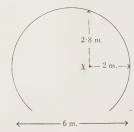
Disposition of apparatus with respect to walls of underground tunnel.
